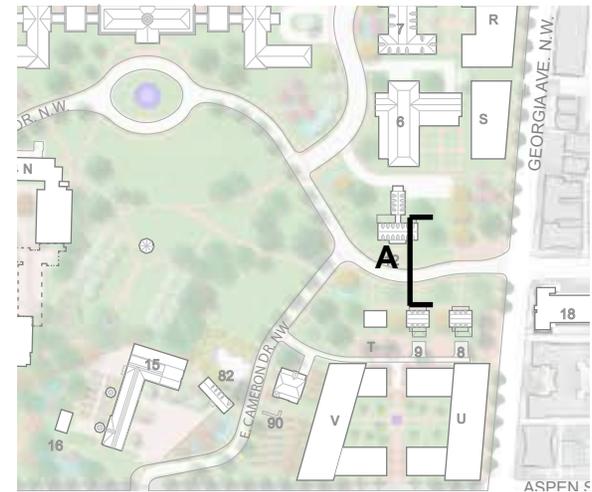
Street Sections Key Plan - Cameron Glen. Source: Perkins+Will
